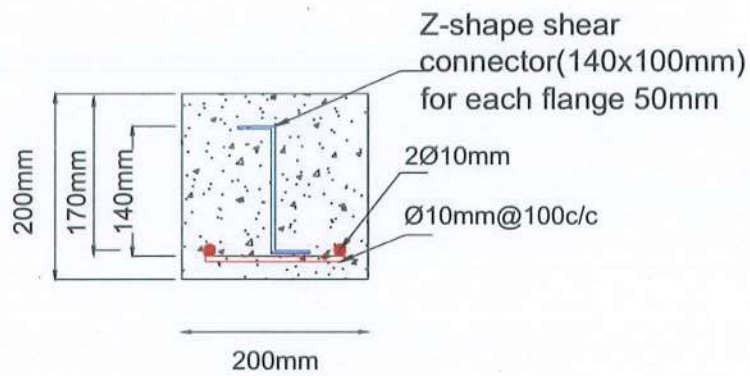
Cross-Section for Beam with Z-Shape Shear Connector.
